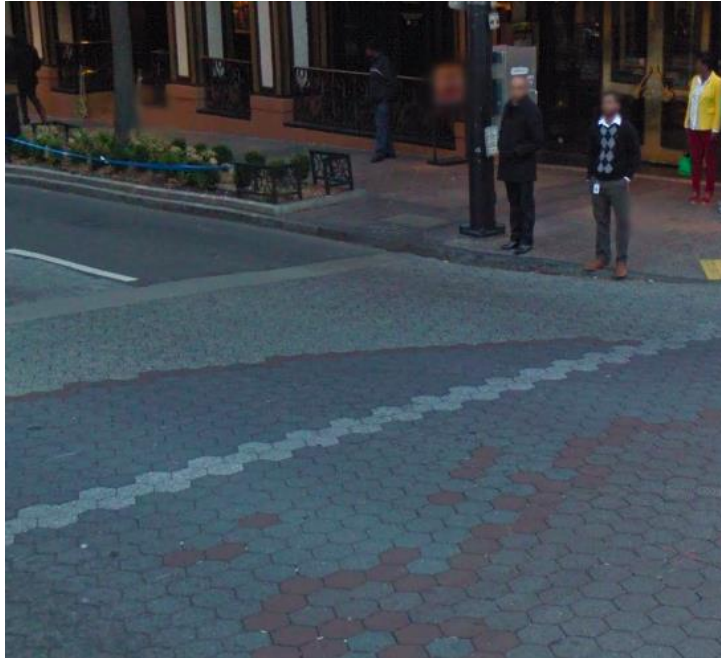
Andrew Young International Boulevard and Peachtree Street. Another example of poor crosswalk designation. Pavers should be installed to clearly mark horizontal stripes and create perpendicular stripes for the crosswalk area, or the area should be repaved.
